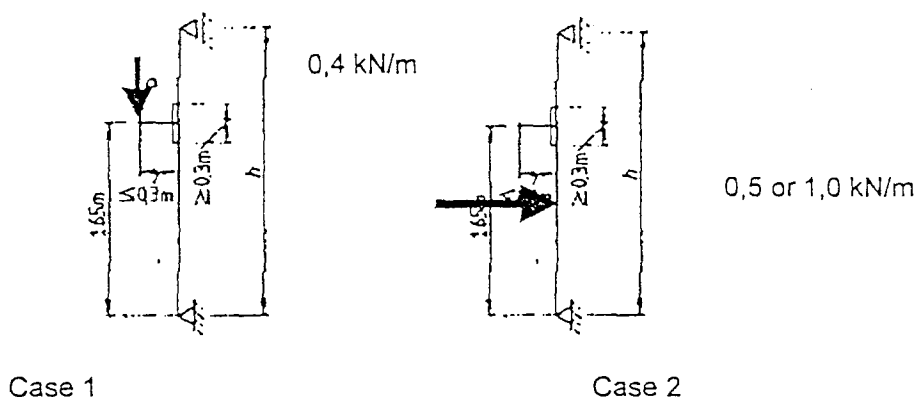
The system and loading which has to be verified for non load bearing walls in Germany
